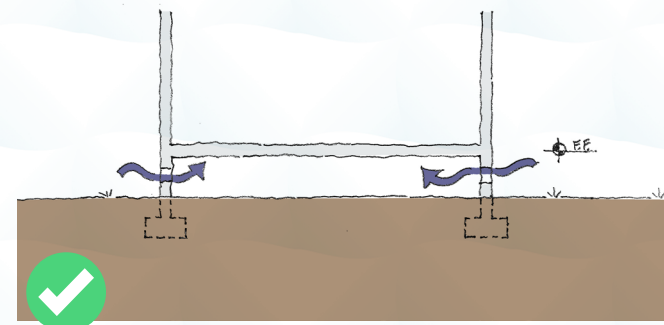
Historical stem wall footing and hung joist raises finished floor above ground level and allows for passive cooling of home.
